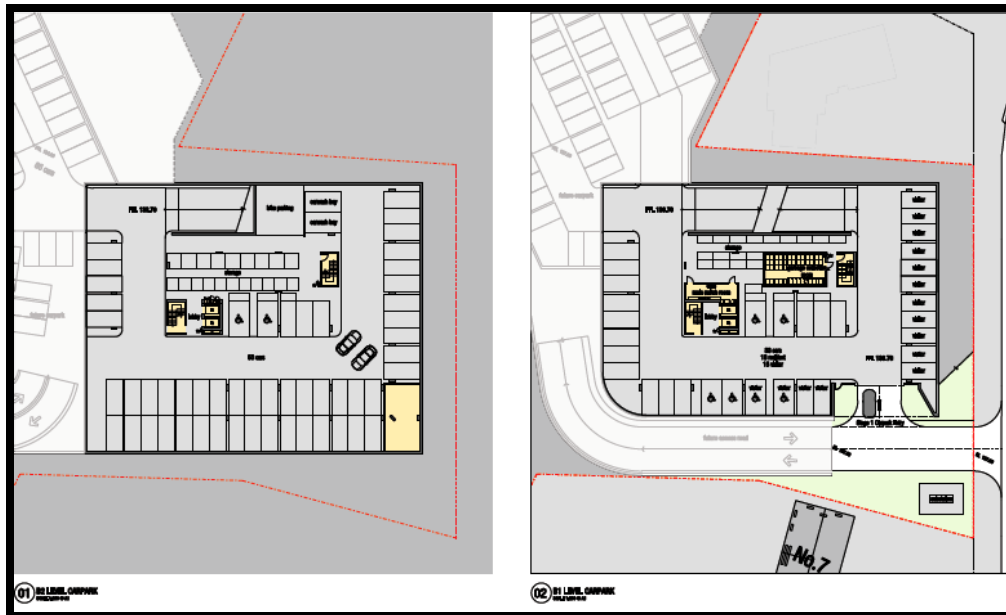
B2 Level Carpark & B1 Level Carpark. (Source: Anchor Mortlock Woolley, 2009)
